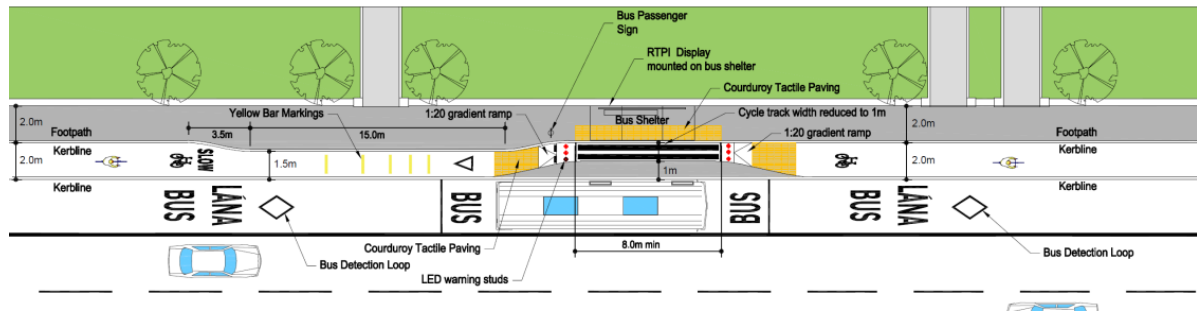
Shared Bus Stop Landing Zone layout
